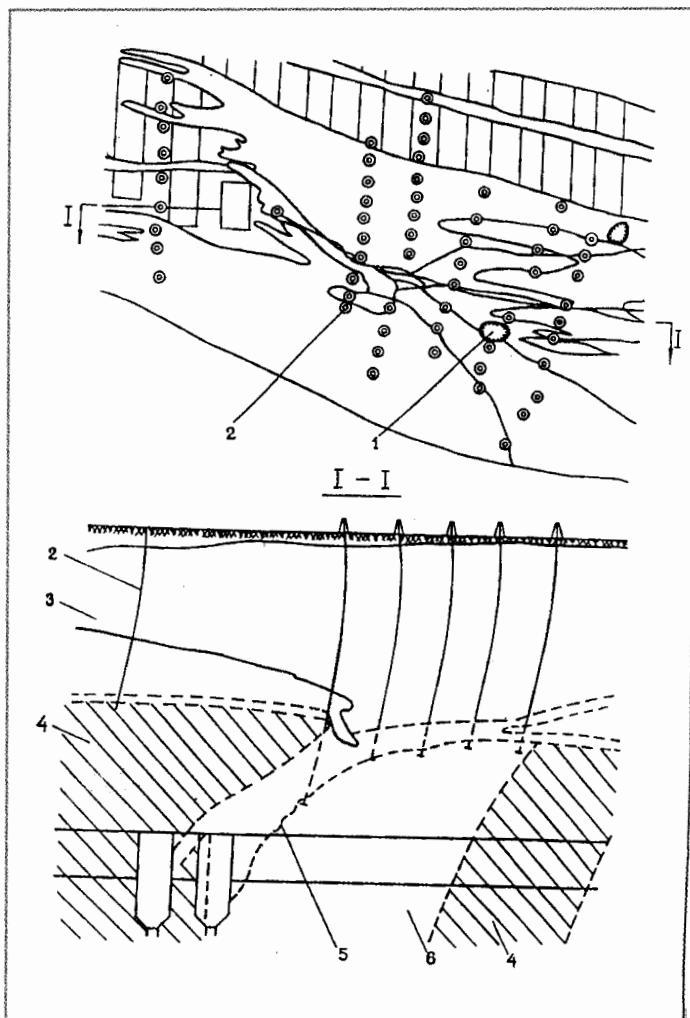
Grouting scheme used during restoration of productive chambers at Stebnick Potash Plant.
